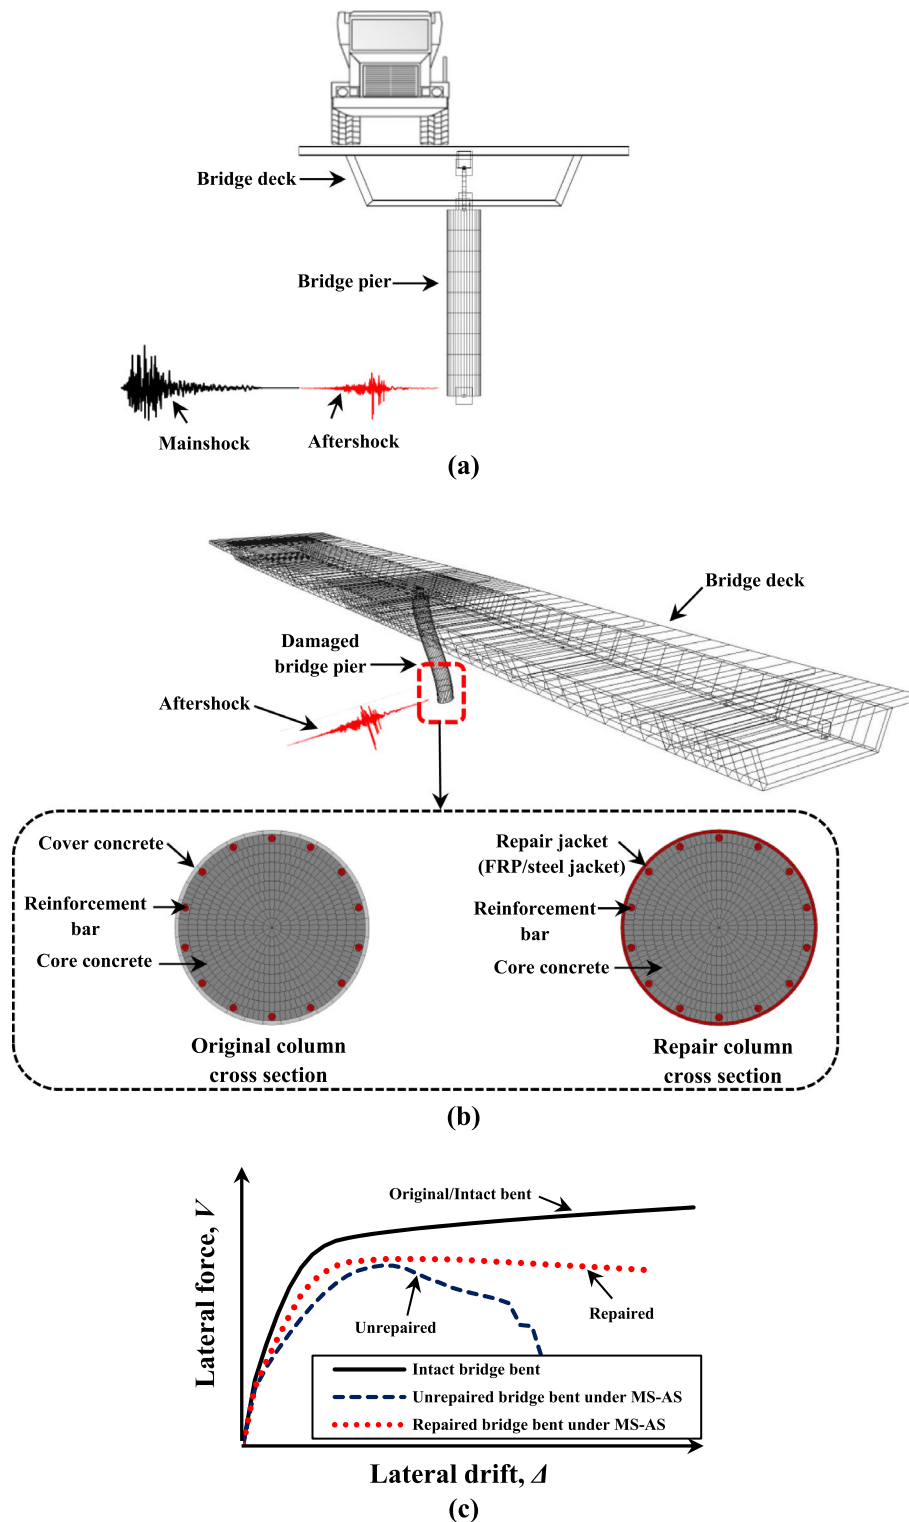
Repair jacket application on mainshock-damaged single column RC bridge pier, a bridge pier subjected to mainshock-aftershock sequence; b bridge pier at incipient collapse after the mainshock with/without repair jacket in the plastic hinge region, and c representative lateral force–displacement relationship of a bridge bent in the original, unrepaired and repaired condition.
